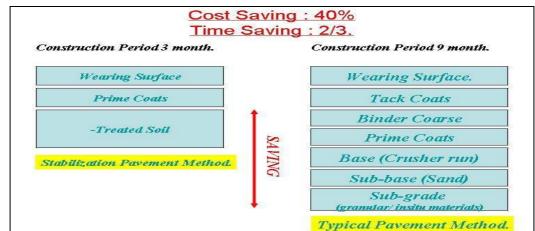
Comparison of road structure between conventional method and soil stabilization road.
